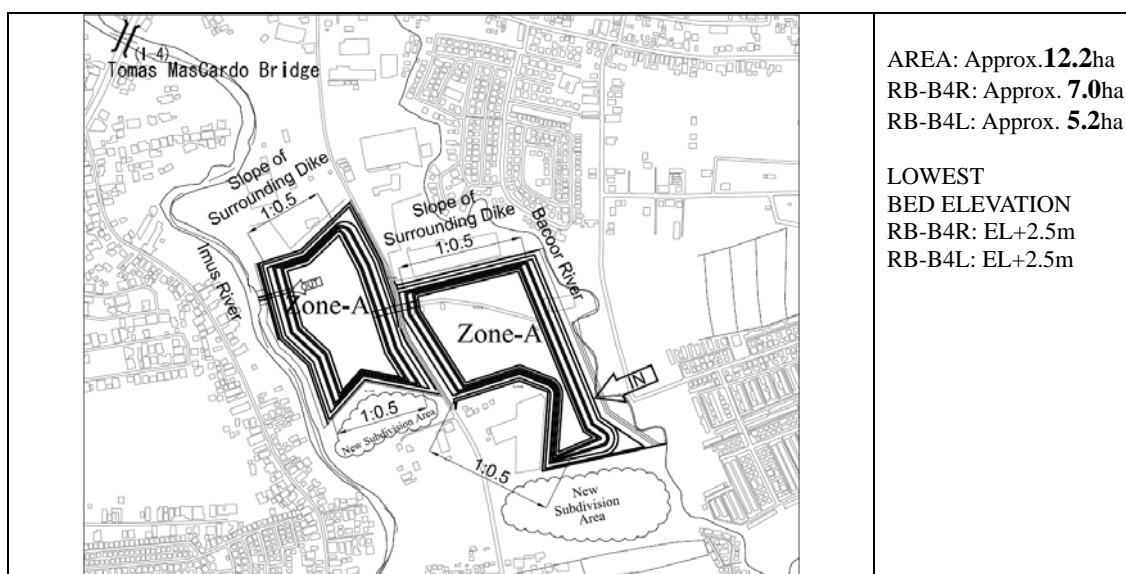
Plan of Bacoor Retarding Basin with Revised Slope Gradient (12.2 ha)
